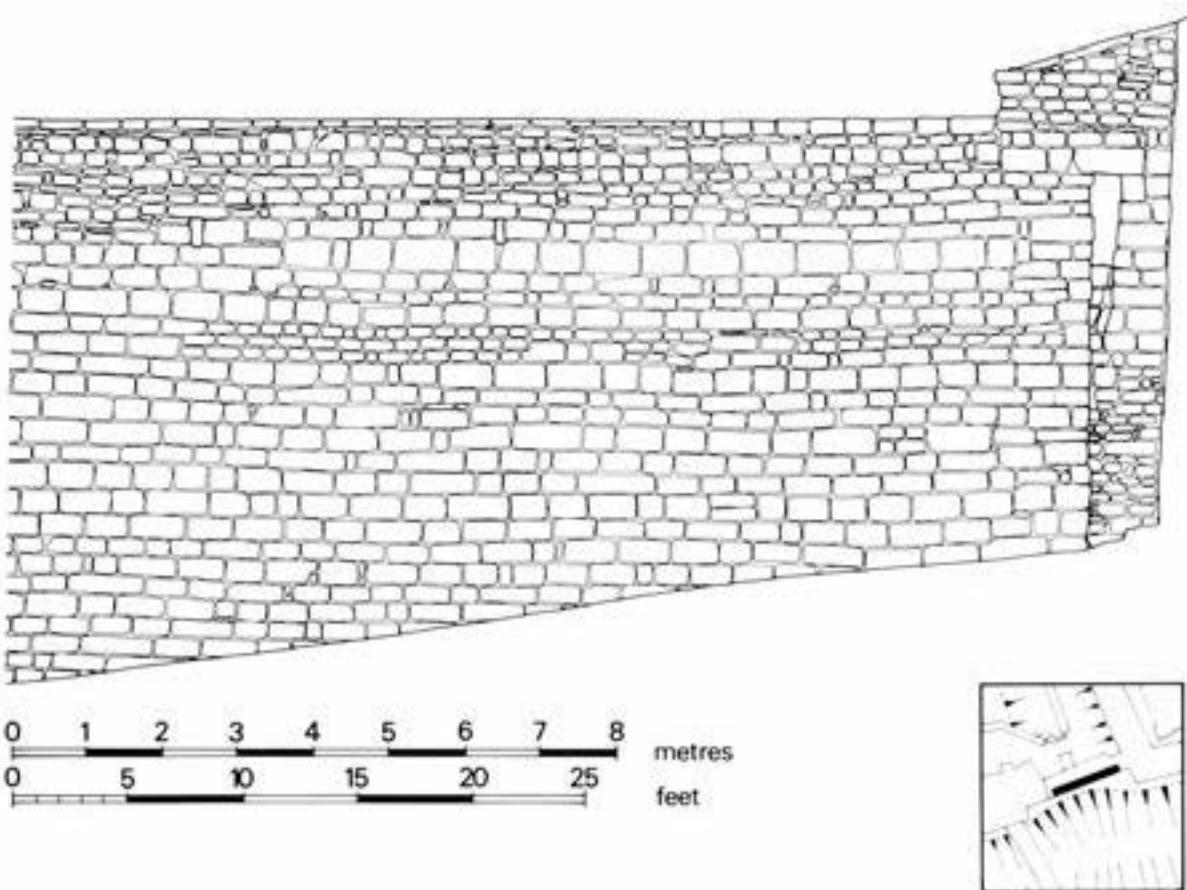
The south curtain wall between the outer gatehouse and the re-entrant
